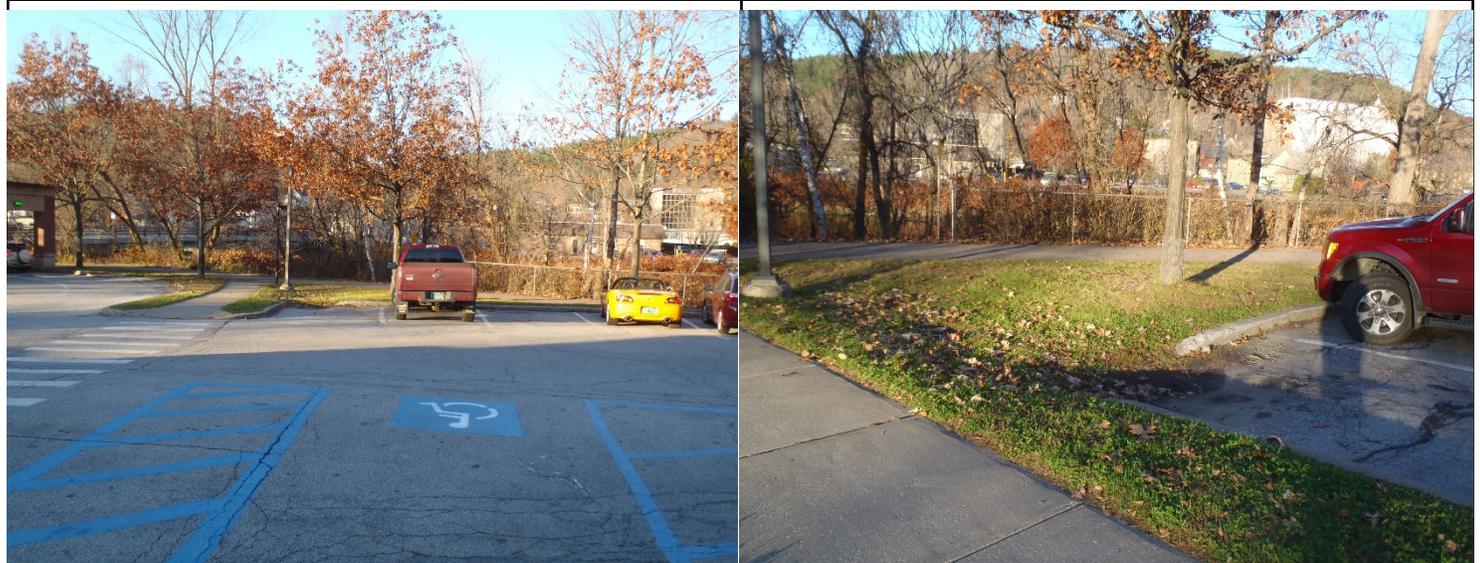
Parking lot is graded to drain toward existing green space | Photo 2: Sediment accumulation notes at corner of parking lot
